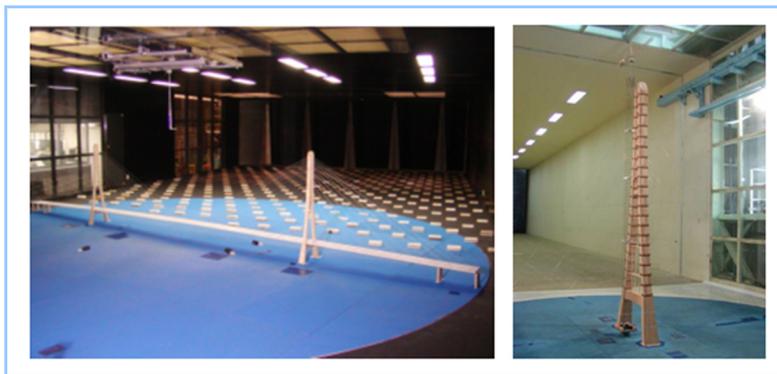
Example of wind tunnel test for overseas bridge construction (Nanjing 3rd Bridge in China)
